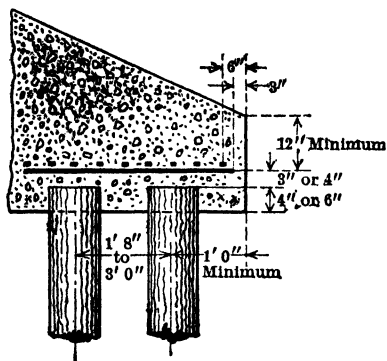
Detail of Reinforced-Concrete Footing on Wood Piles
